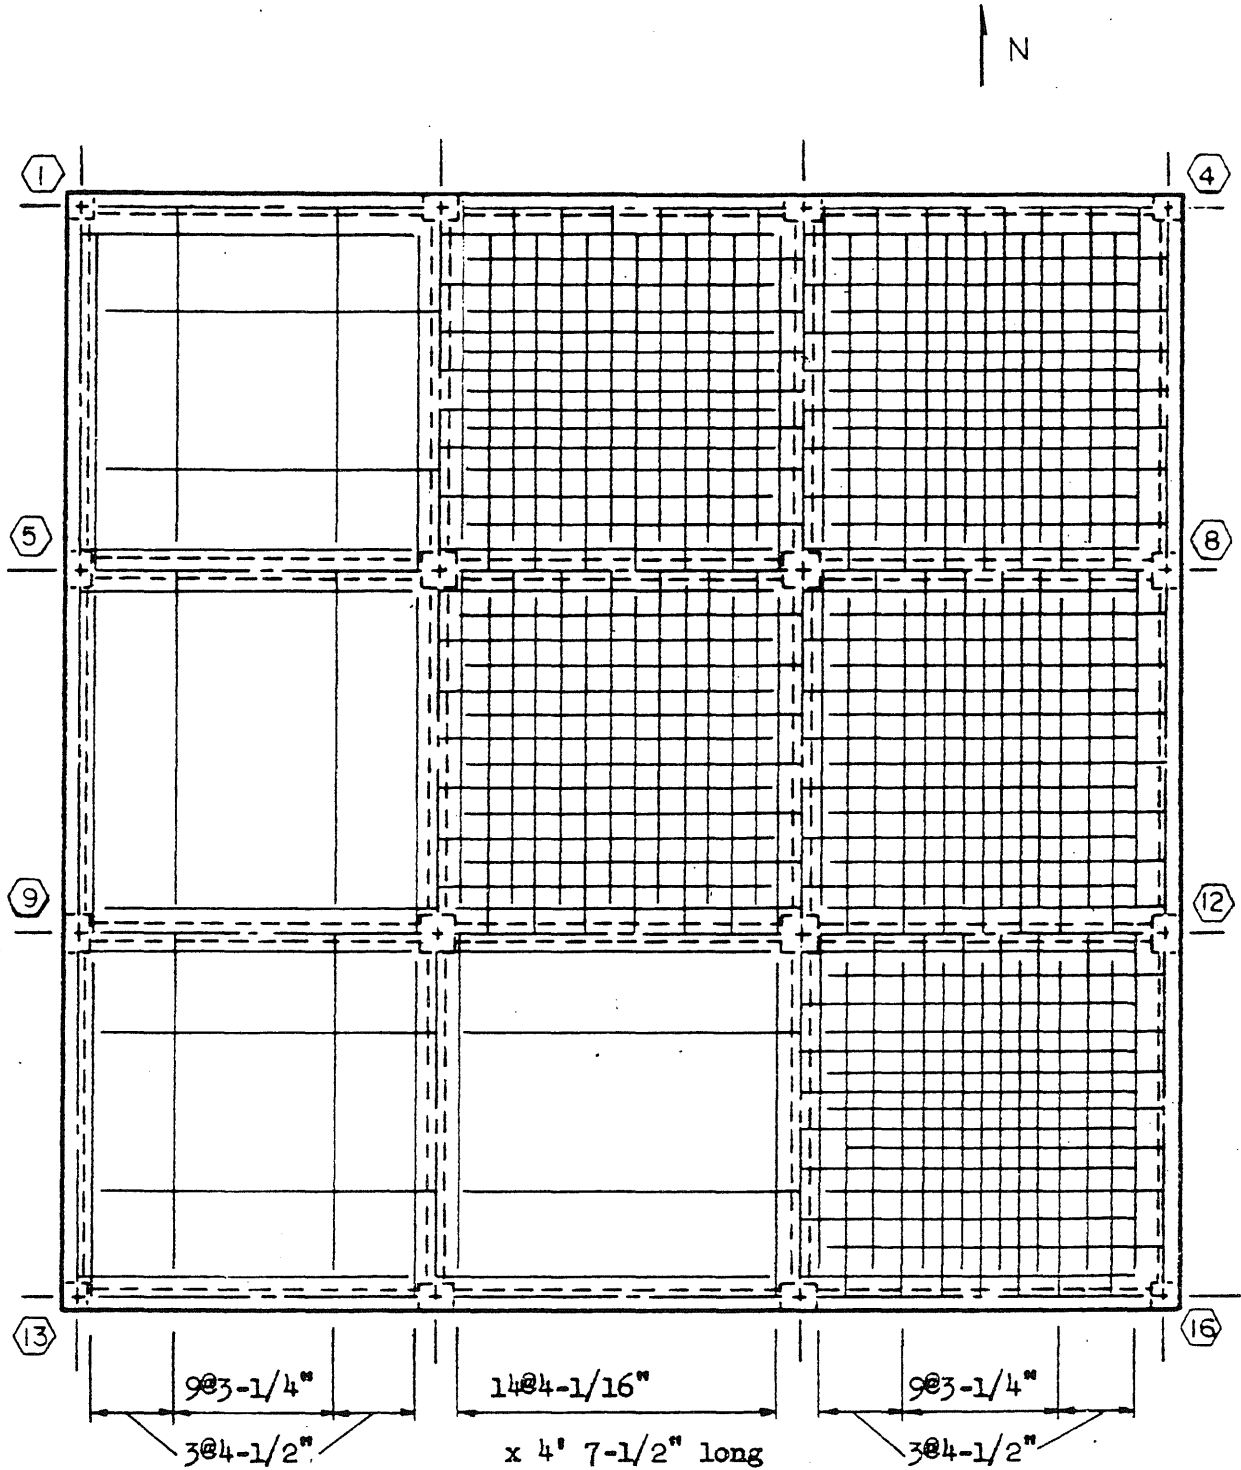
ARRANGEMENT OF REINFORCEMENT IN BEAMS IN THE FLAT SLAB TEST STRUCTURES (F2, F3)
